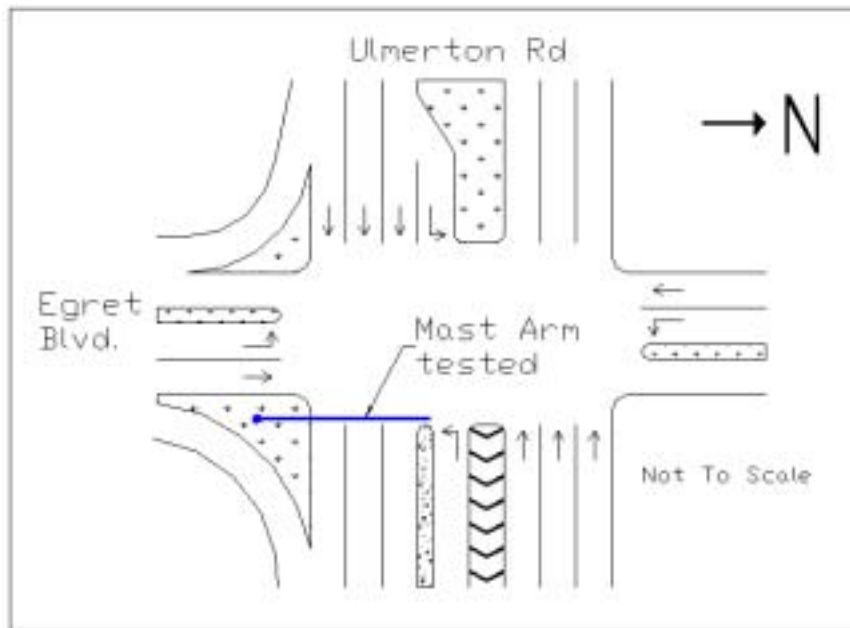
Plan View of Tampa Mast Arm Intersection
